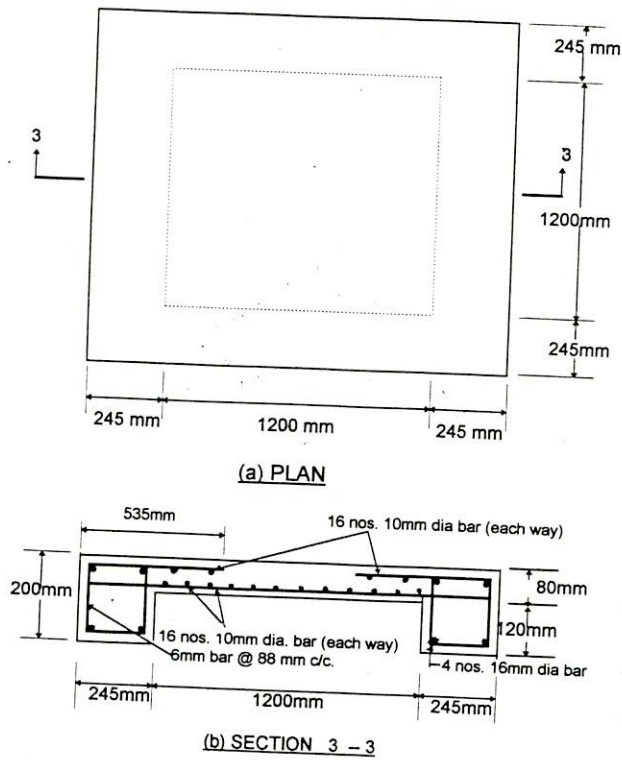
(a) Plan (b) Section and reinforcement details of SLAB3
